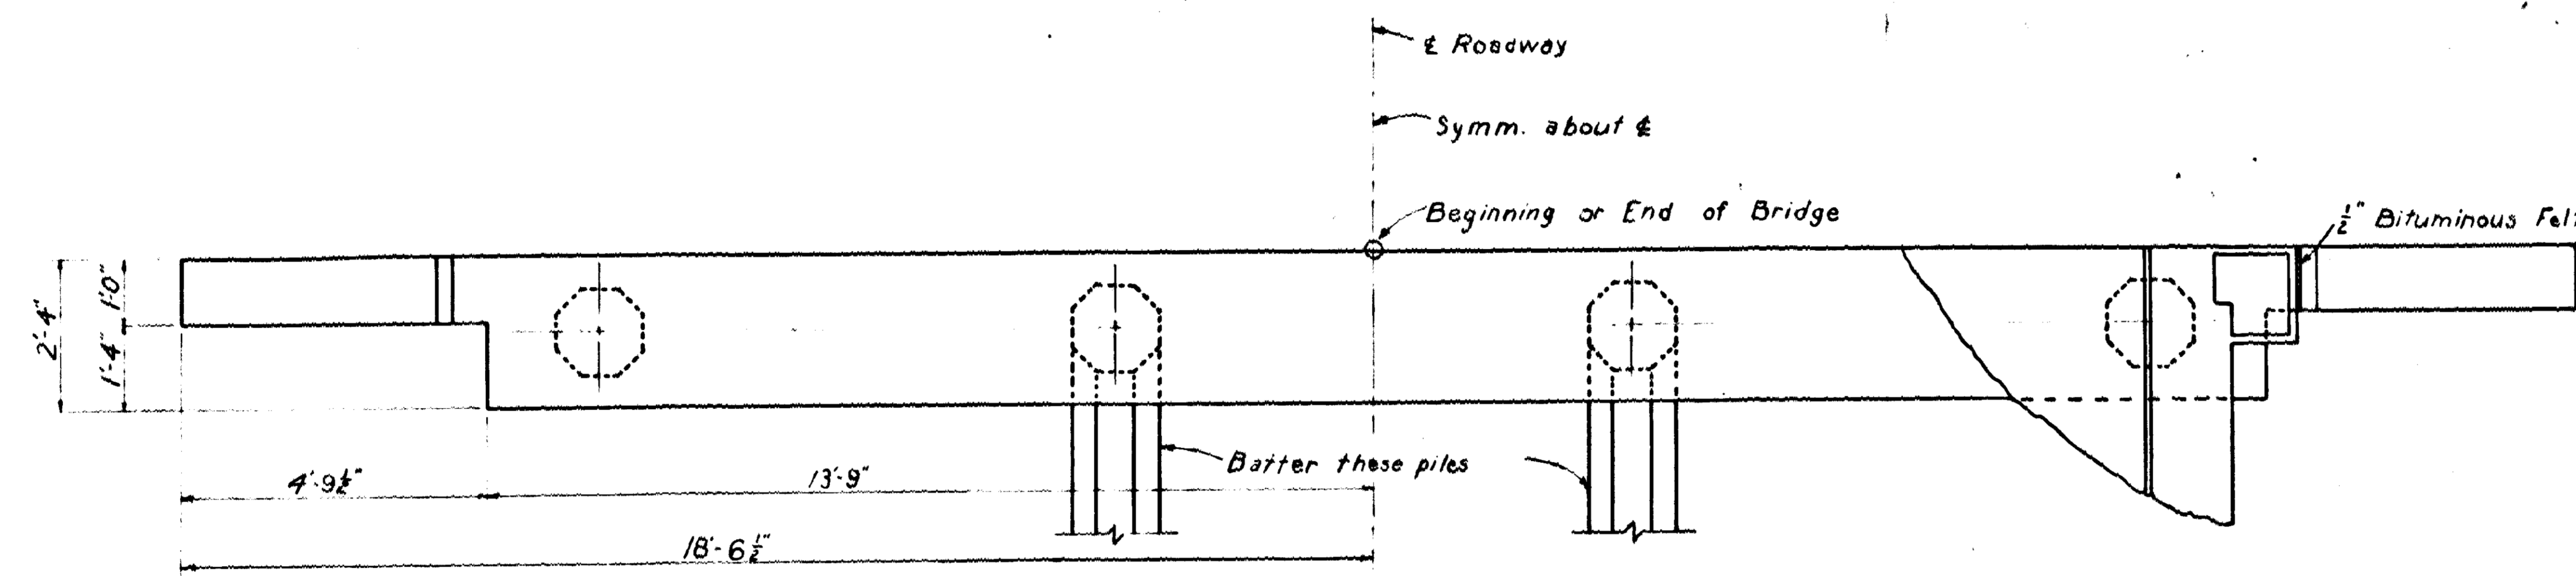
DETAILS OF STANDARD 28'-0" R.C. SLAB SPAN
